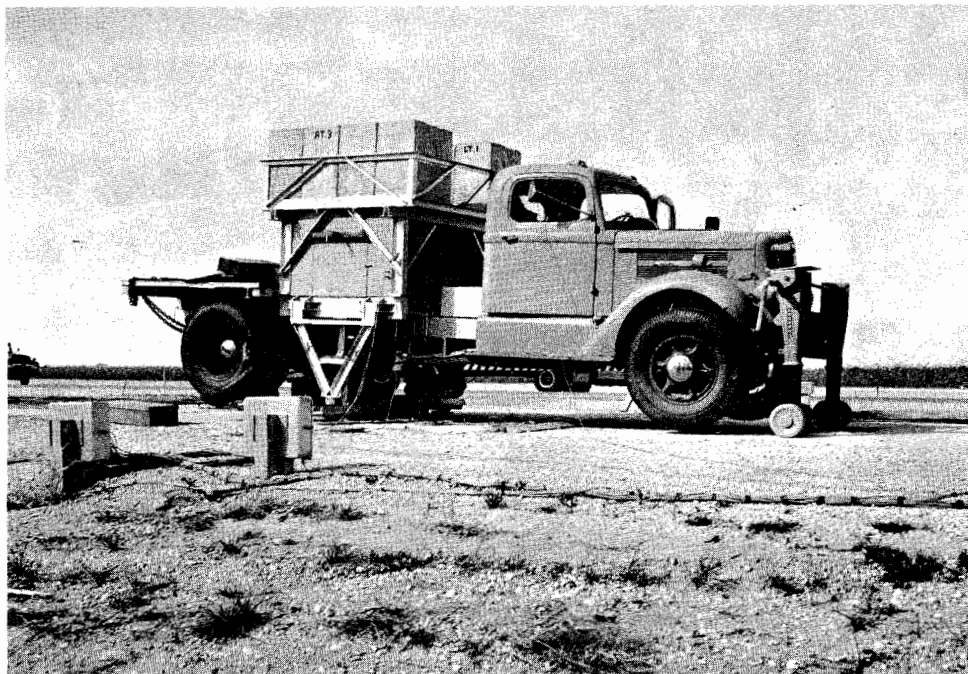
TRUCK-MOUNTED VIBRATING LOADER READY TO APPLY LOAD TO THE PAVEMENT
